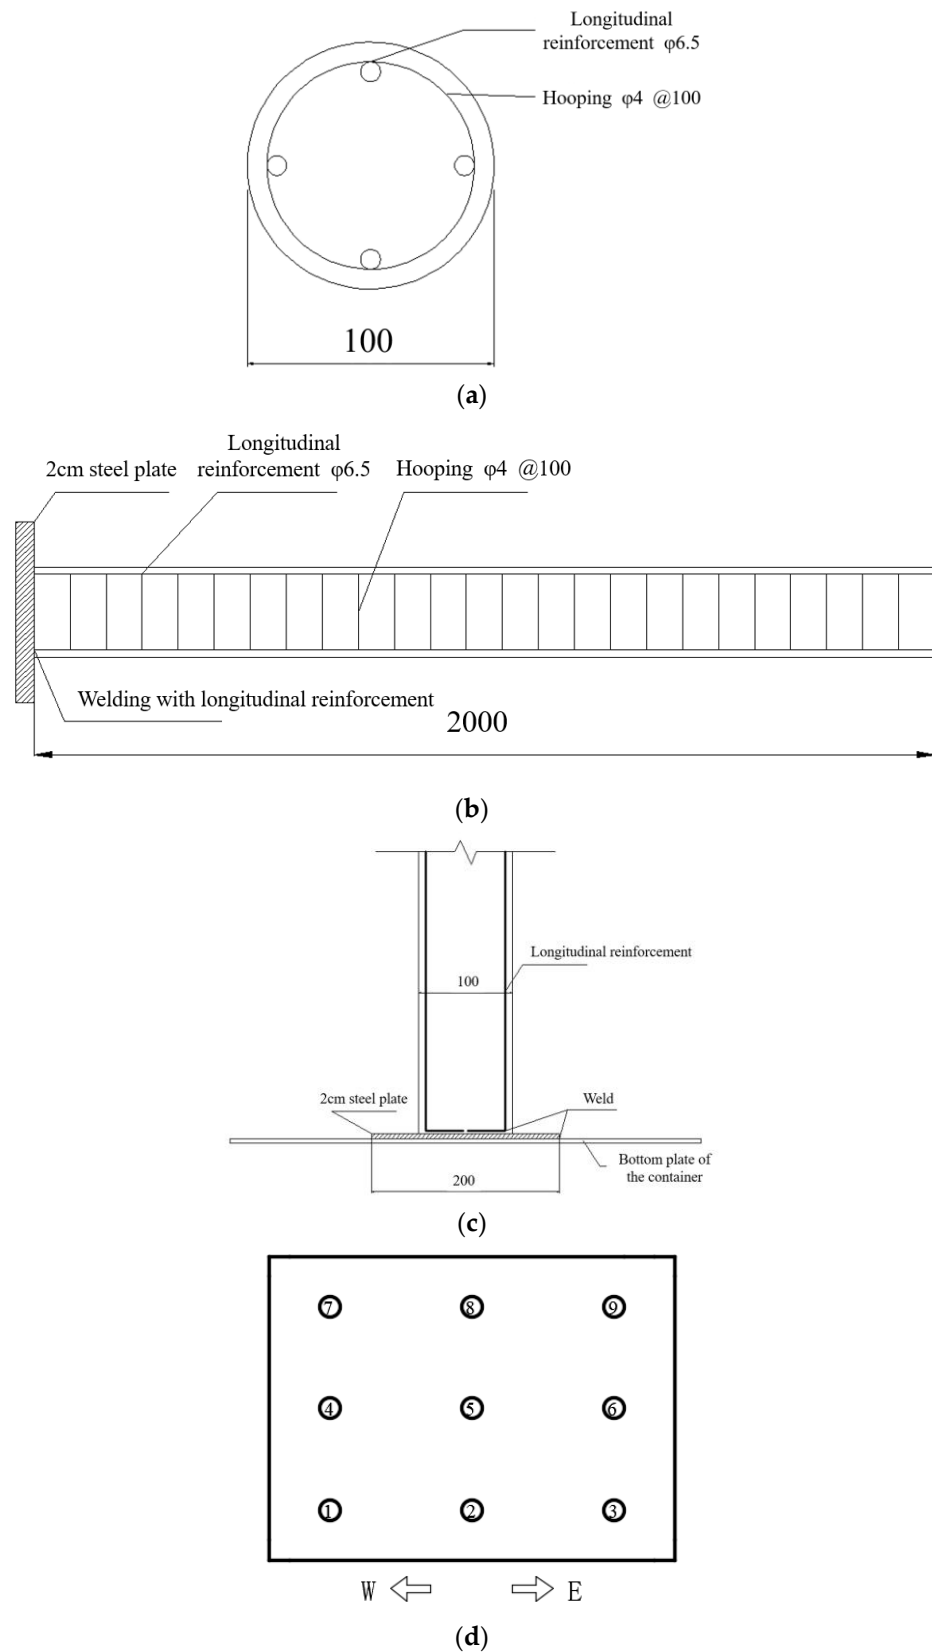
Diagram of pile group foundation. (a) Cross-section of single pile reinforcement. (b) Vertical section of single pile reinforcement. (c) Diagram of connection between piles and soil container. (d) Layout of pile group.
